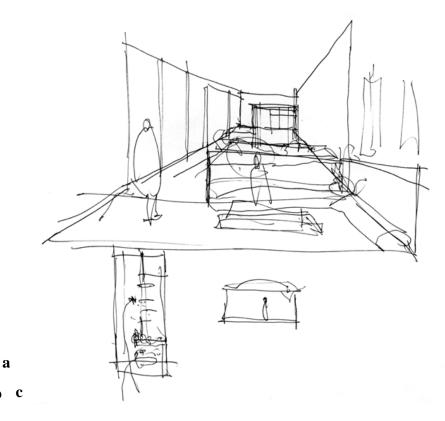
Noi's drawings for task 4: (a) Sectional perspective showing windows, chief architect's office in the back, reception area with couches, table, painting on walls and people. (b) plan, (c) section.
